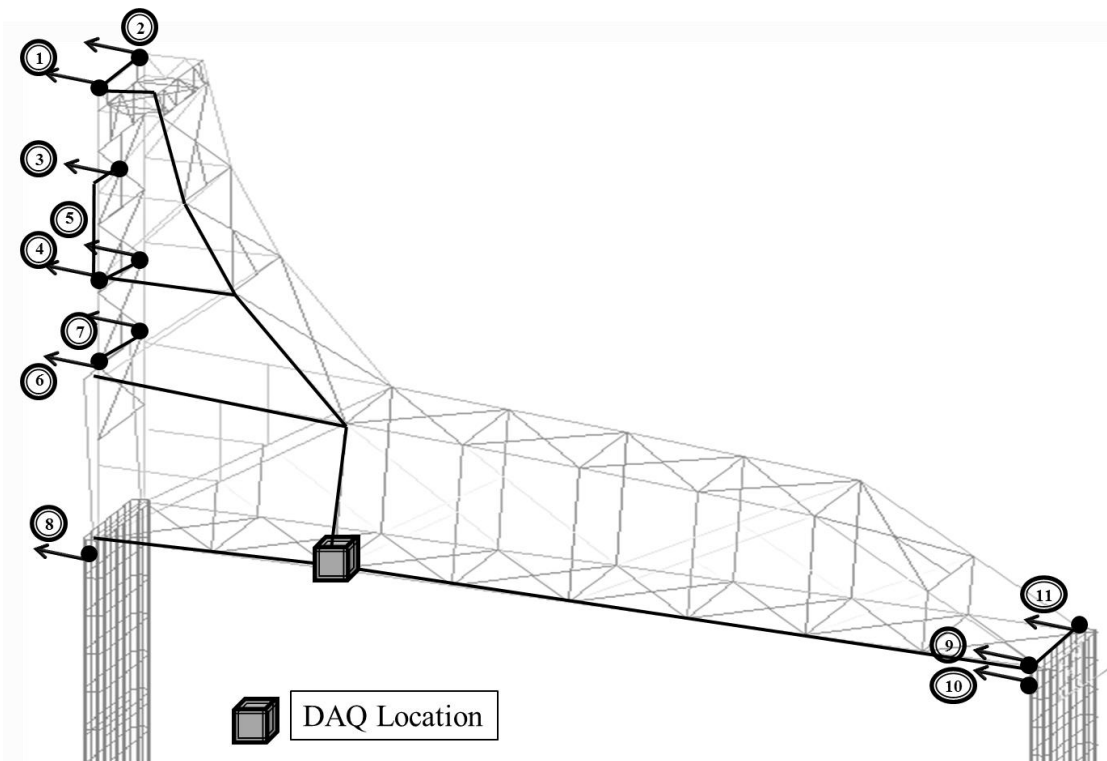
Tower Span Longitudinal Instrumentation Plan
